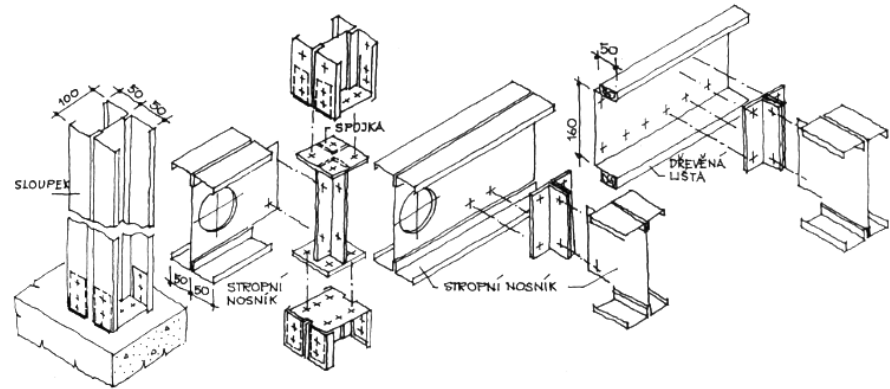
| Trusteel construction system (Bílek, 1990)
